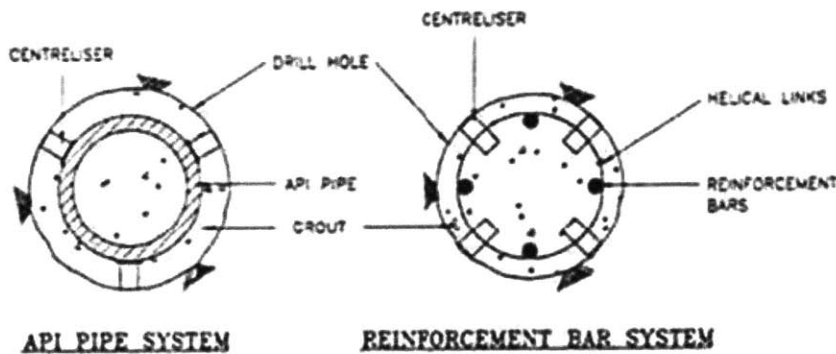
Typical Cross Sections of Two Common Micropile System [5]
